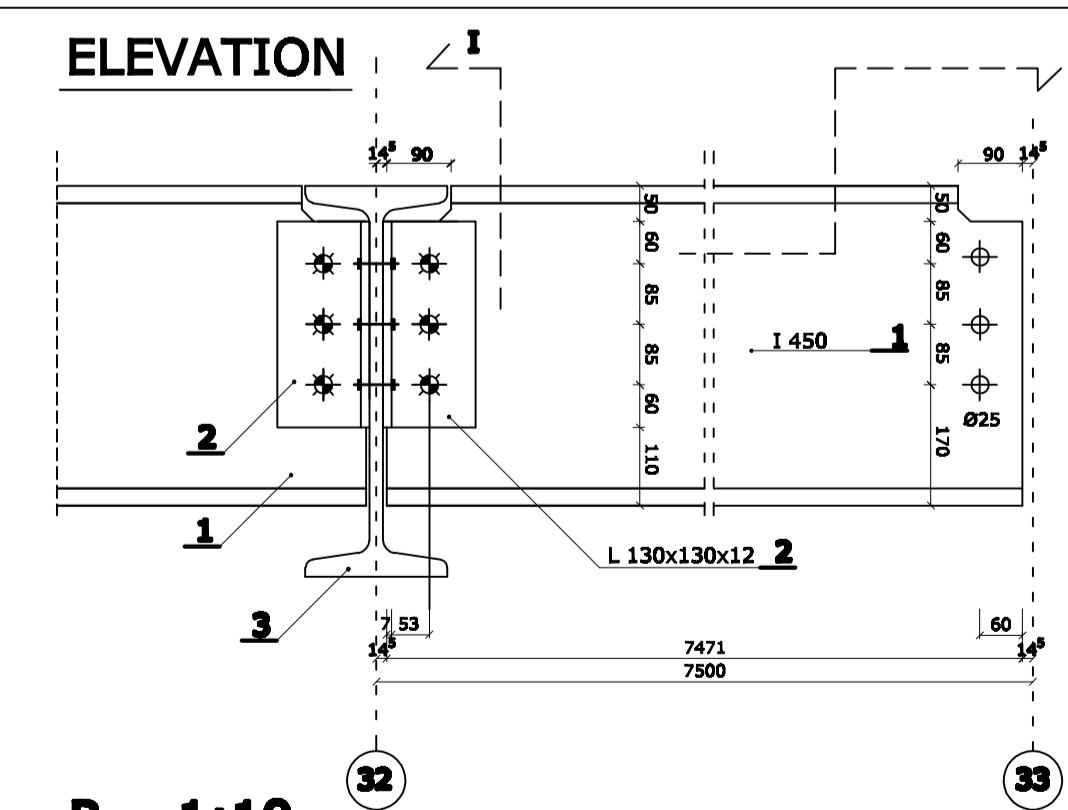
CONNECTION - PRIMARY TO SECONDARY BEAM 1:10
